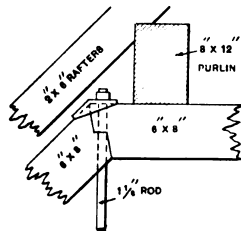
Detail of Joint 3 in Truss 7 of November issue.
